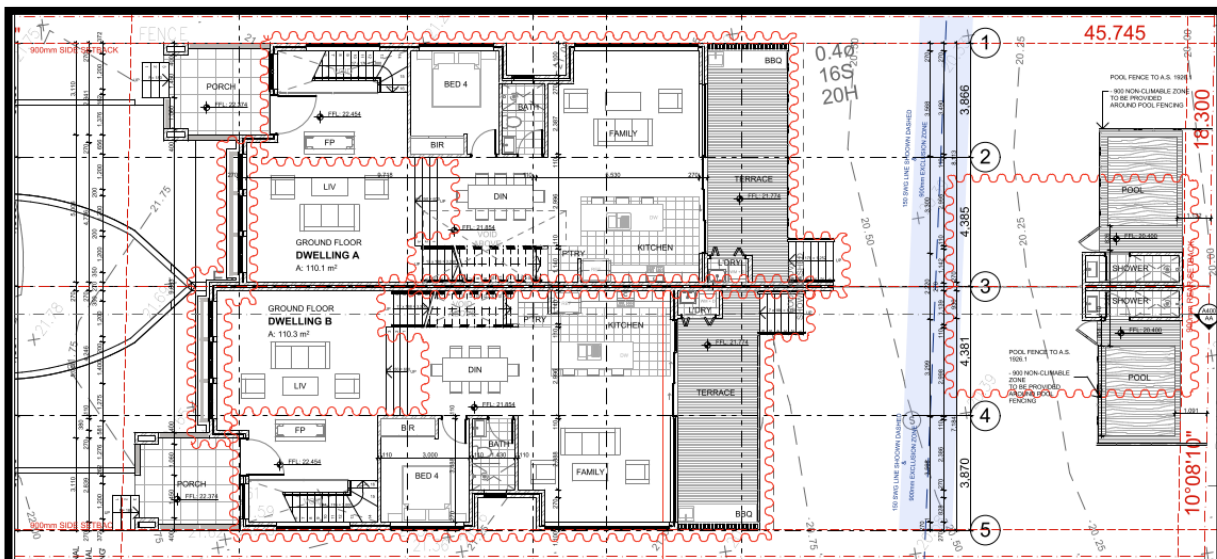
A. Extract of the proposed ground floor plan in the subject modification application.
